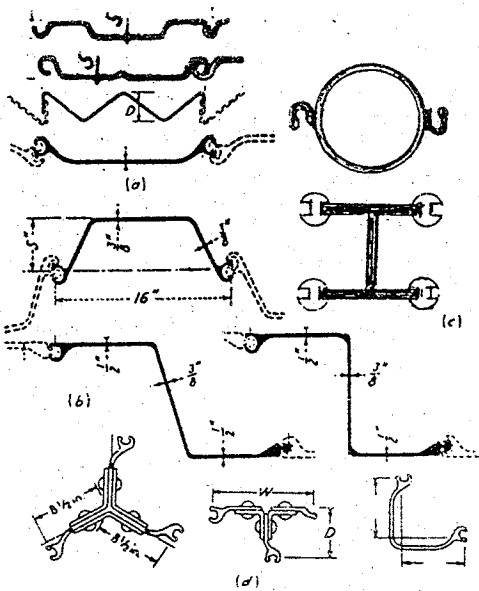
Typical steel sheet piles (a) lightweight/shallow webbed, (b) deep webbed & (c) H-box and tabular steel piles (d) interlocking joints
